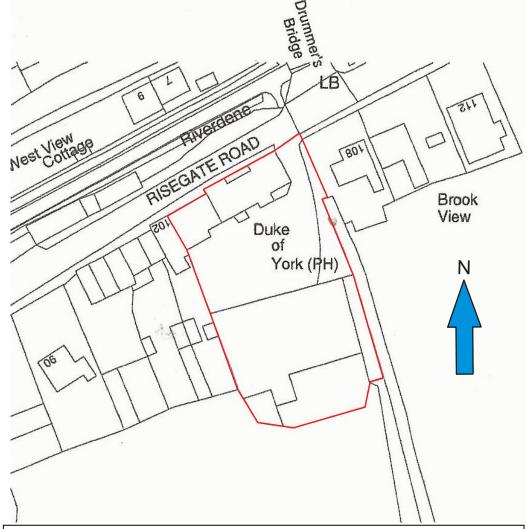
Site location at an original scale of 1:1,250, (extract from Architects plan)
